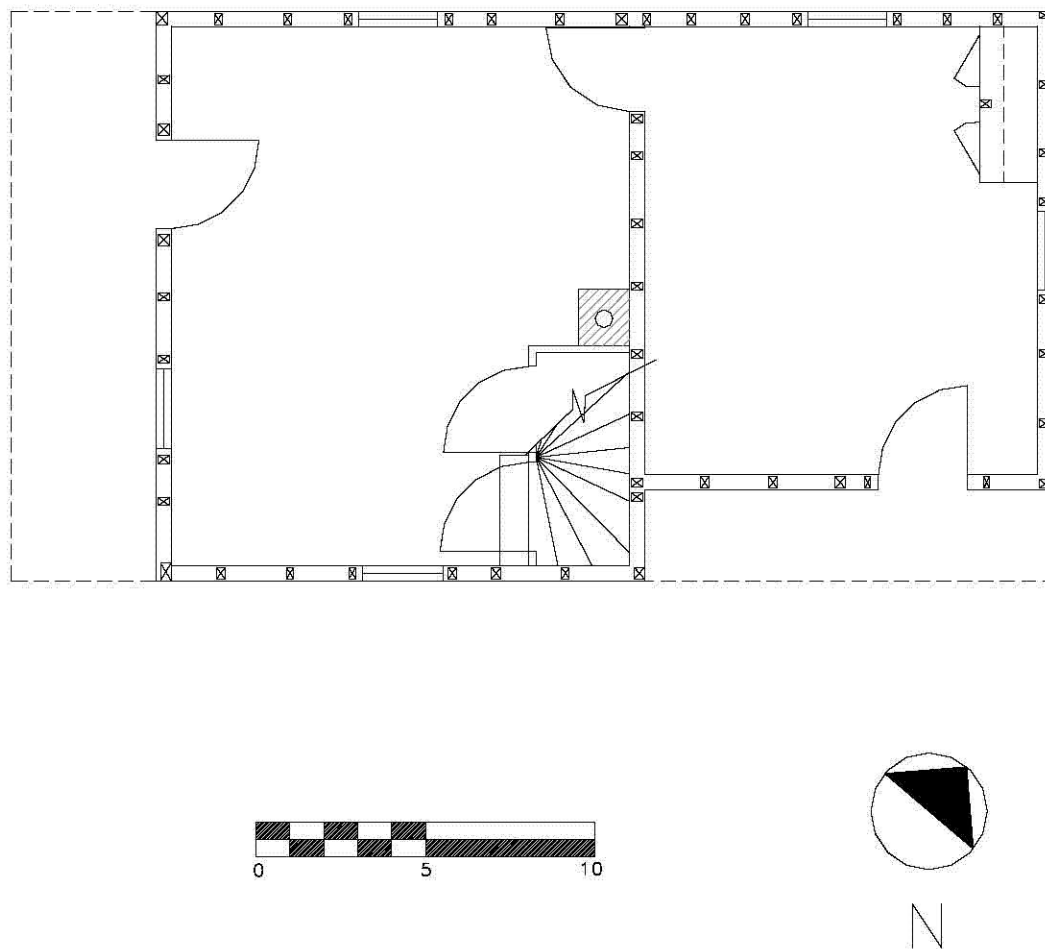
Hayes-Campbell Tenant House, first floor plan.
